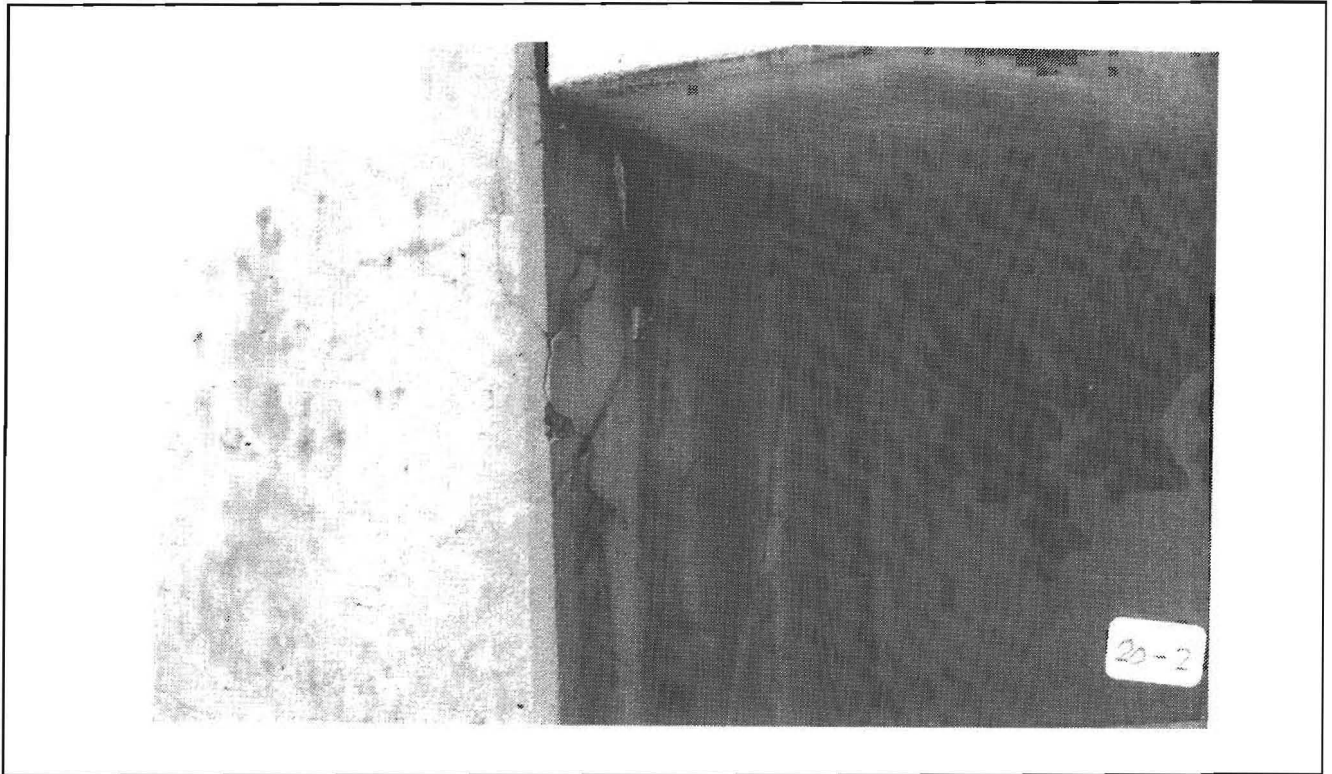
Observed Damage to Abutment Backwall, Early Stage of Development (US69 at Lucas Dr. in Beaumont)
